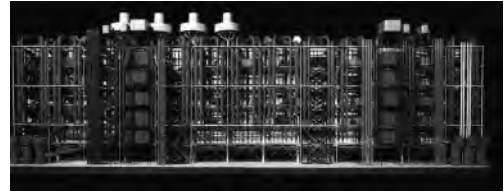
Piano+Rogers Architects and Ove Arup & Partners, Centre Beaubourg, Final Design, Rue du Renard Façade, December 1973- Spring 1974 (Renzo Piano Foundation, Genoa).
